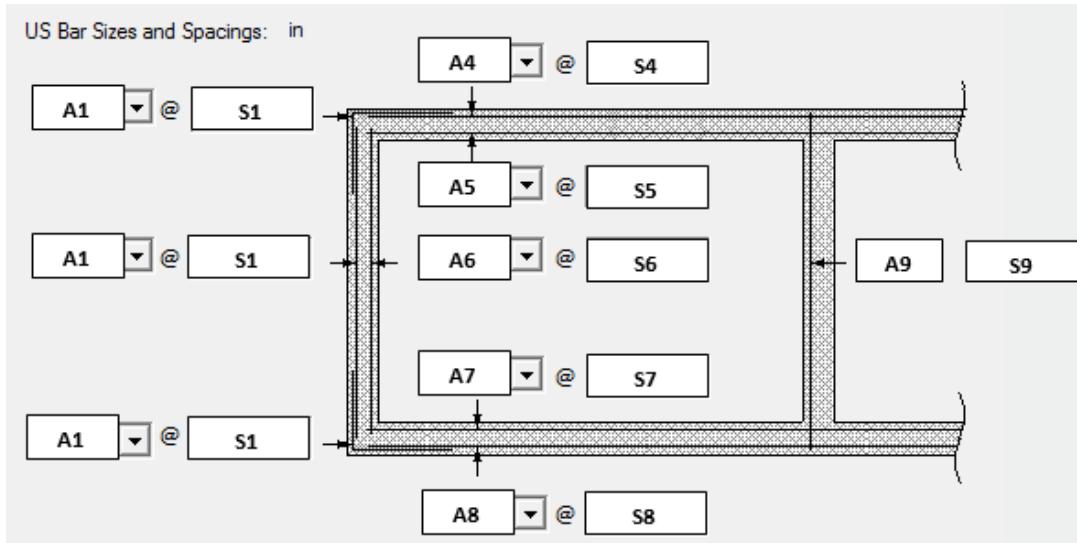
Typical Steel Reinforcement Section in Box Culverts
